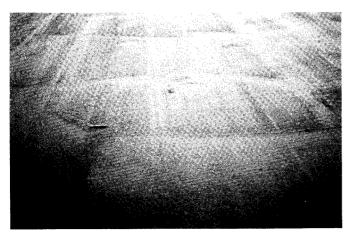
Low-Severity Block Cracking, Filled Cracks
